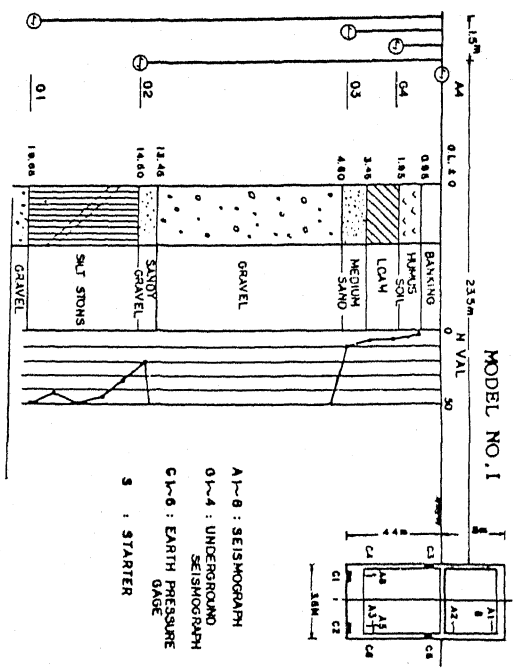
a ARRANGEMENT OF MEASURING INSTRUMENTS
